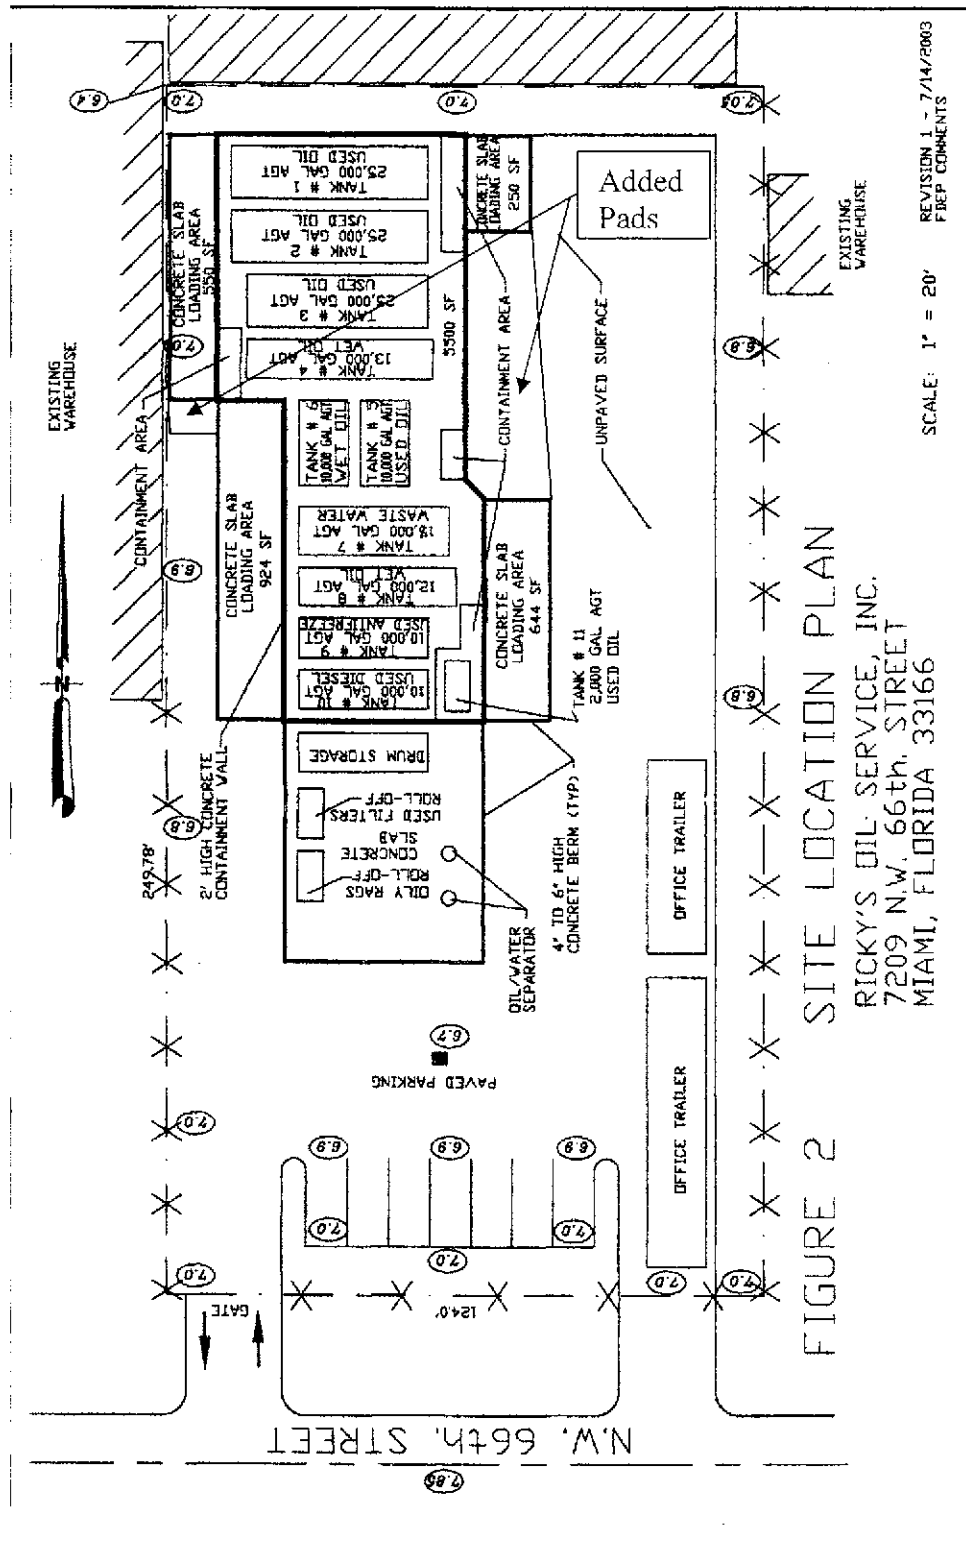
Site Location Plan (updated from previous Application to show two slabs added)
